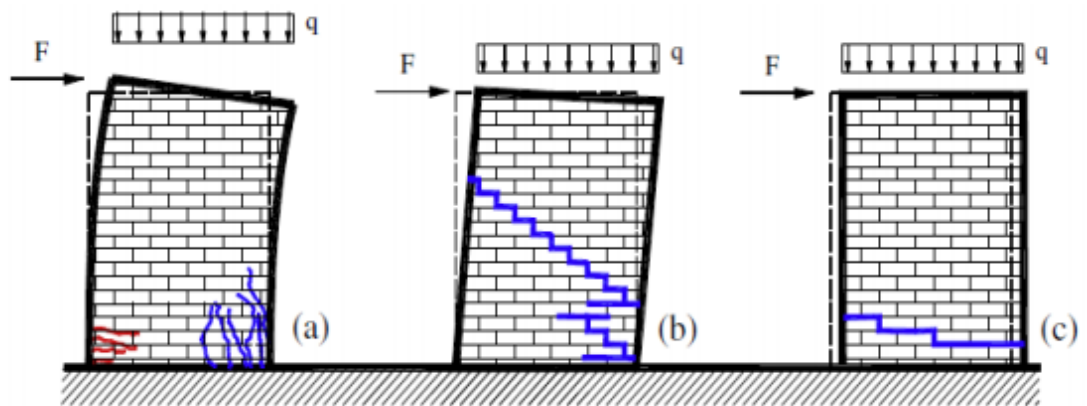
Main in-plane failure mechanisms of a masonry portion: (a) flexural failure, (b) shear-diagonal failure, and (c) shear-sliding failure (Caliò and Pantò, 2014)
